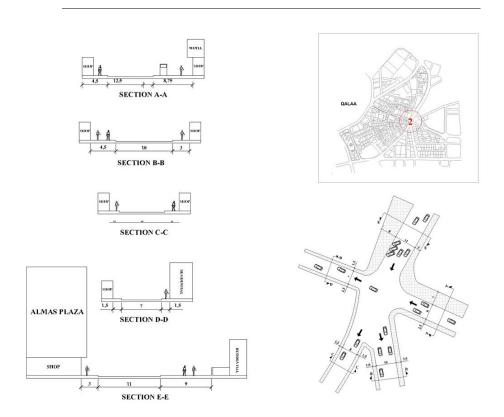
Street intersection details map2 of Khanaqa neighborhood.
